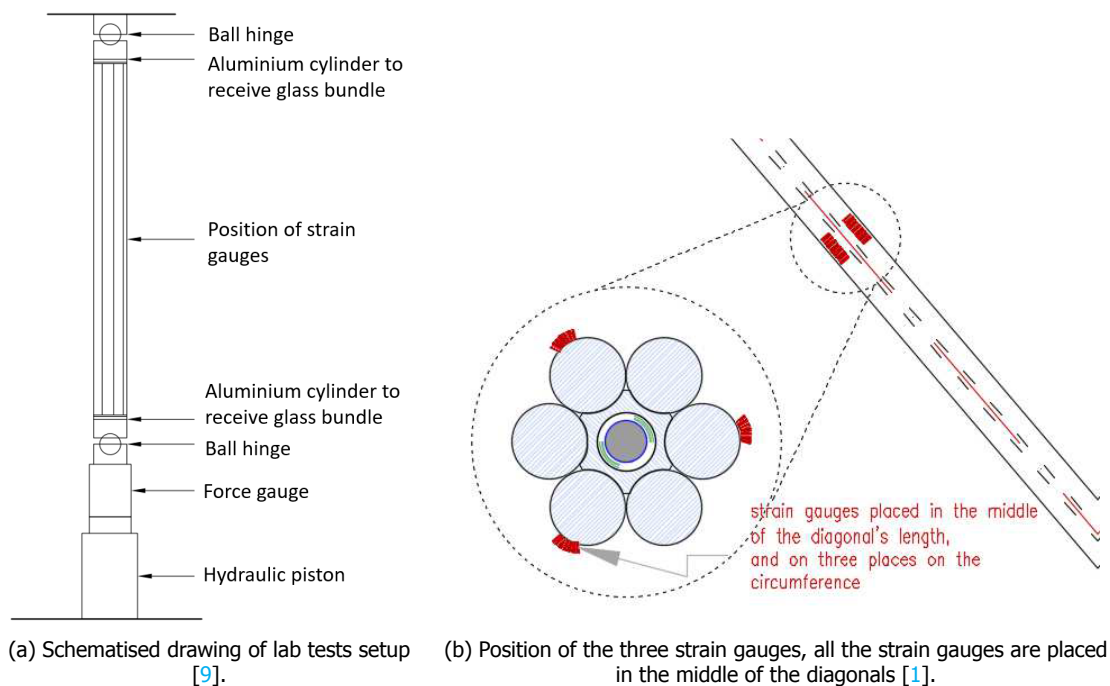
Test setup of the compression tests on the Glass Truss Bridge diagonals.
